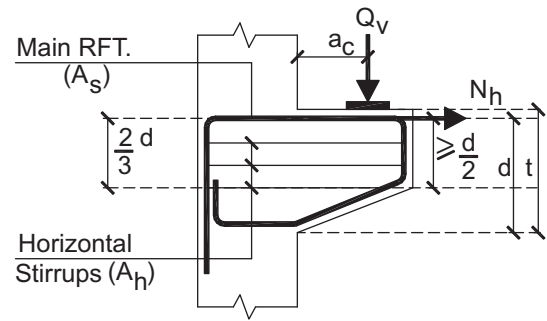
Details of steel reinforcement arrangement and applied forces on the reinforced concrete corbels.
